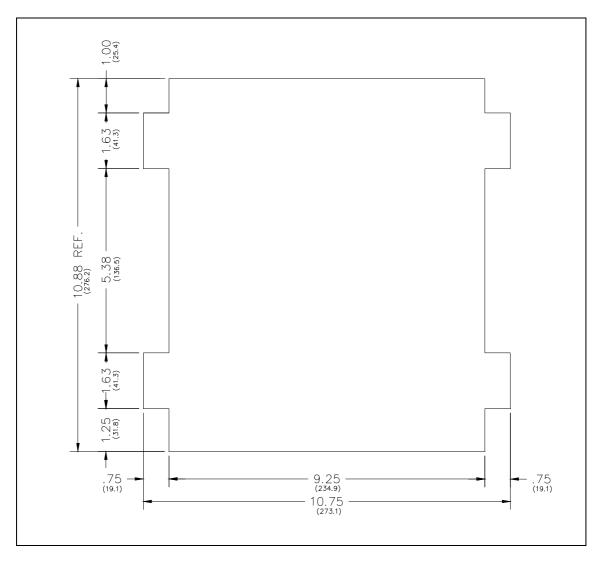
Wall Cut-out Dimensions for Model 112-02-0418-00W
